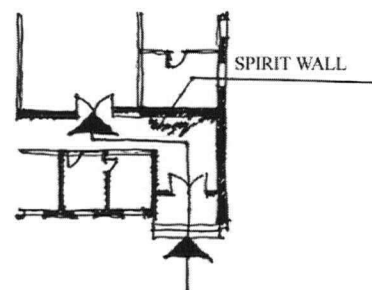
Inside spirit wall—*composite spirit wall (combined with gable)*(by author)
